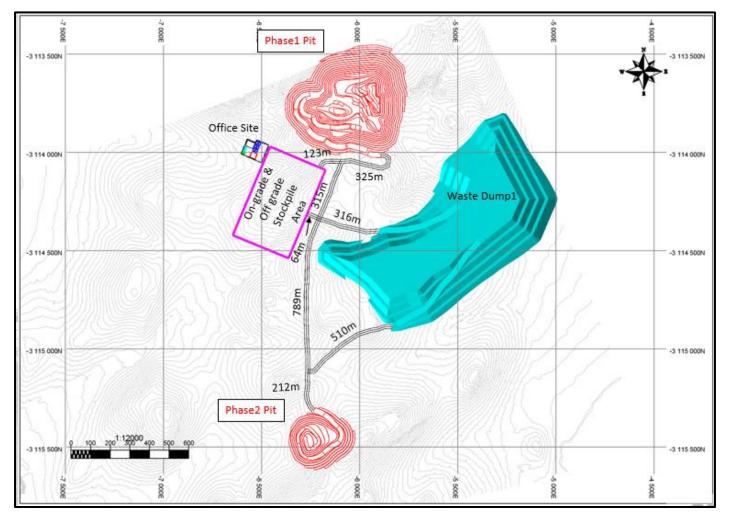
Proposed mine design layout (image obtained from the Mining Work Programme).
